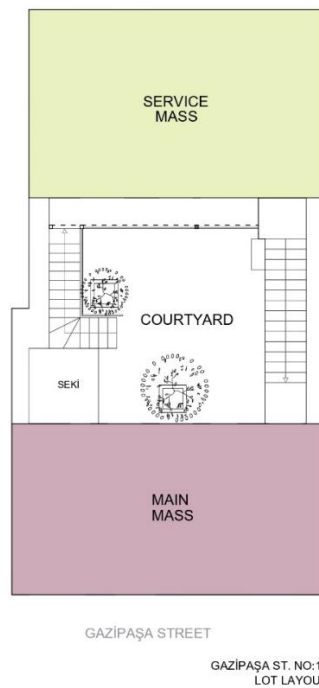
Gazi-16 House lot layout around the courtyard (Author, 2022)
